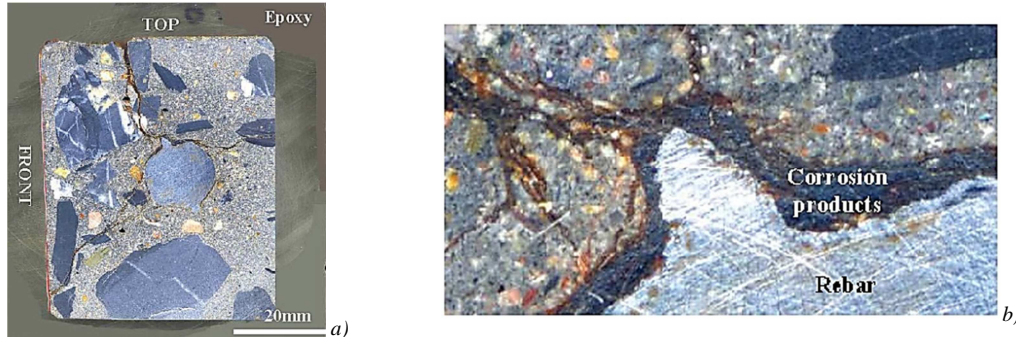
a) Concrete specimen with corroded reinforcing bar: crack propagation; b) Magnified portion of the boxed area, Wong et al.[271]
